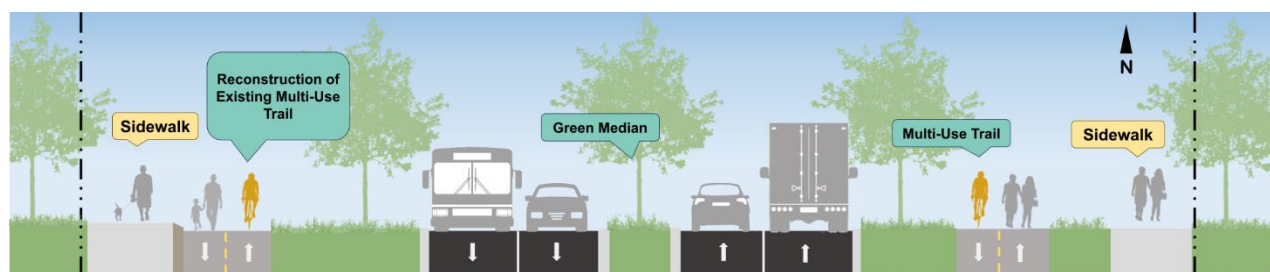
Kipling Avenue Proposed Cross-Section - Mount Olive Drive to Finch Avenue West
